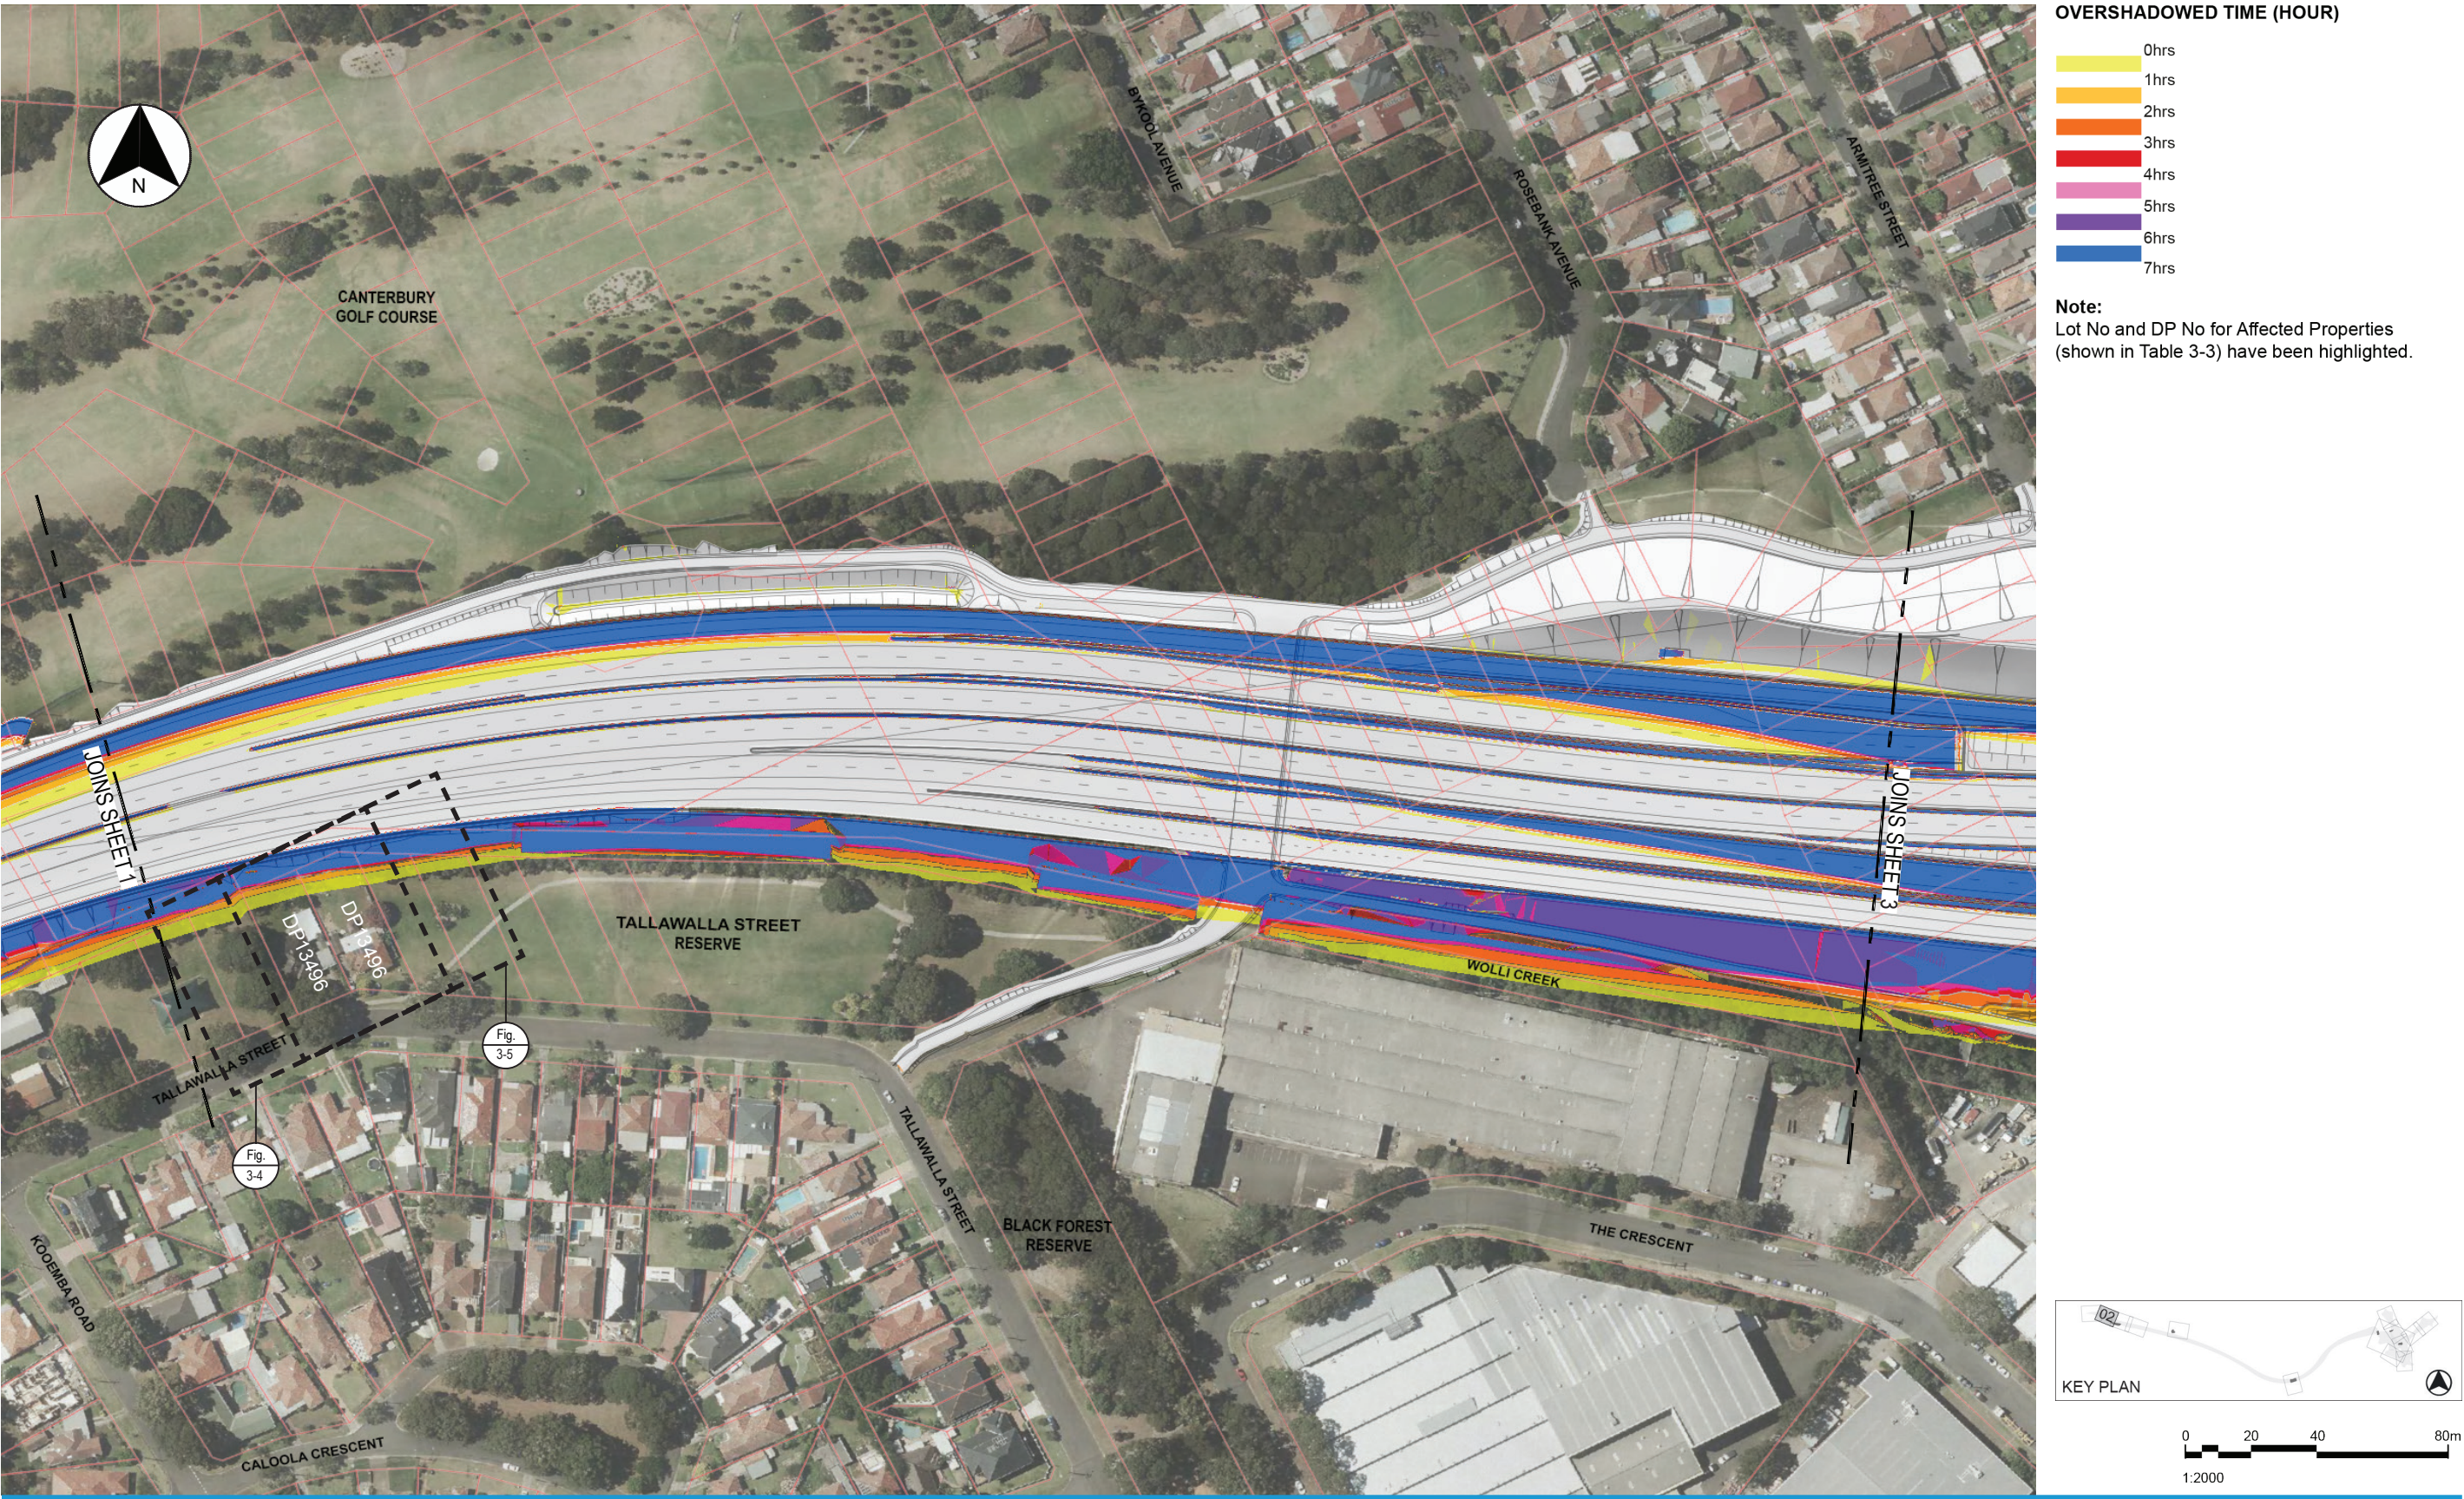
Overshadowing Assessment Plan - Sheet 2 of 14 - 1:2000
